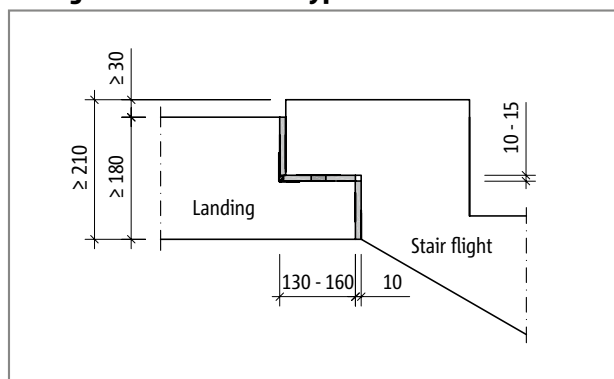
Schöck Tronsole® type F: Design variant superelevated stair connection
